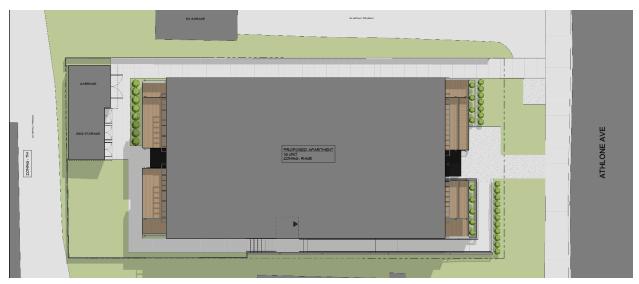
Proposed Site Plan, Colour (Source: Grant Henley Design Group)
